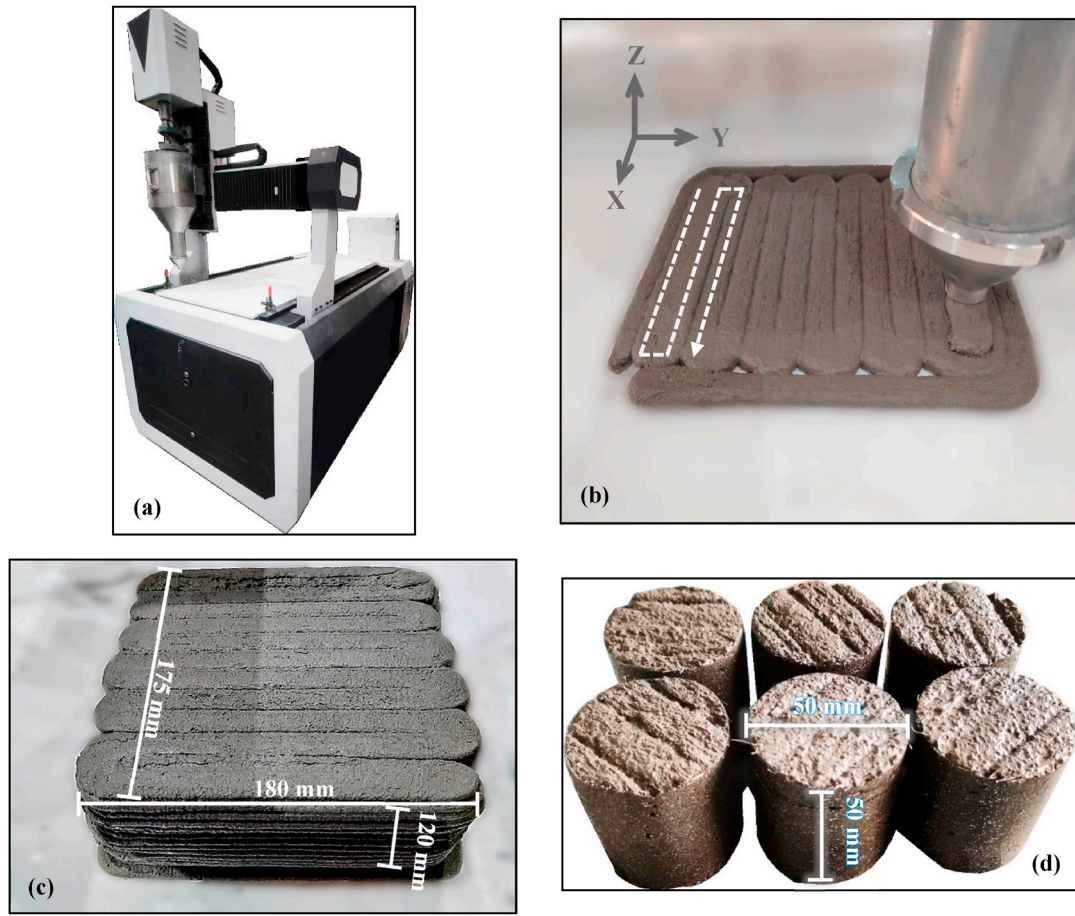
(A) 3D printer (b) prints path (c) 3D-printed concrete block (d) 3D-printed specimen.
